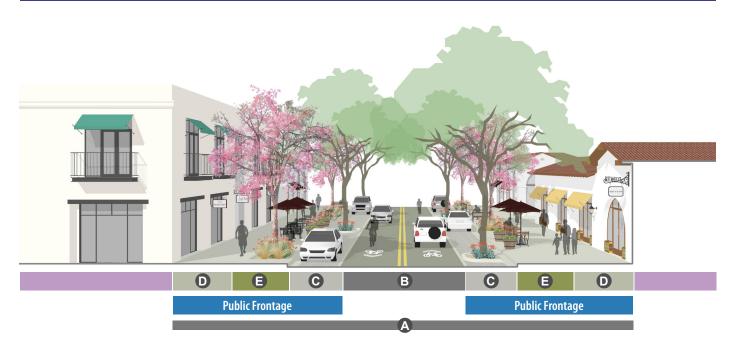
B NEIGHBORHOOD AVENUE 1
